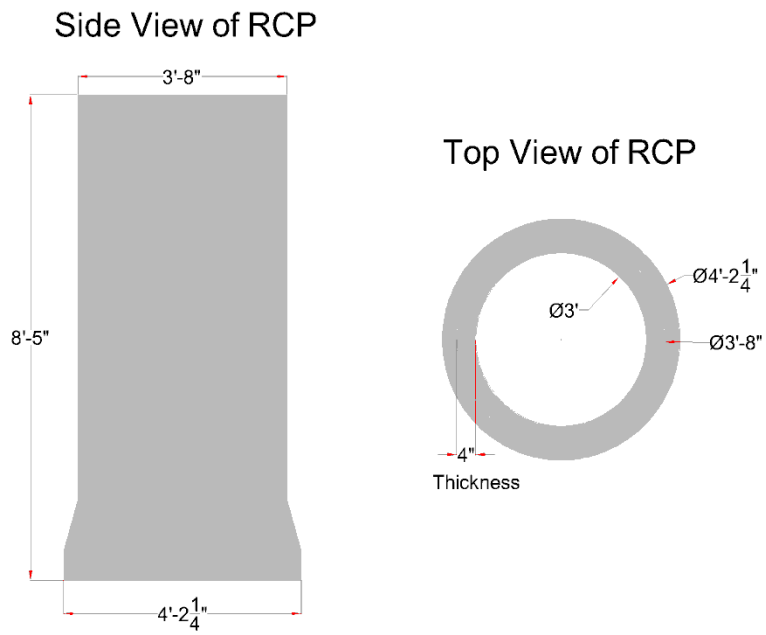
Side View and Top View of RCP (Lagos 2011)
